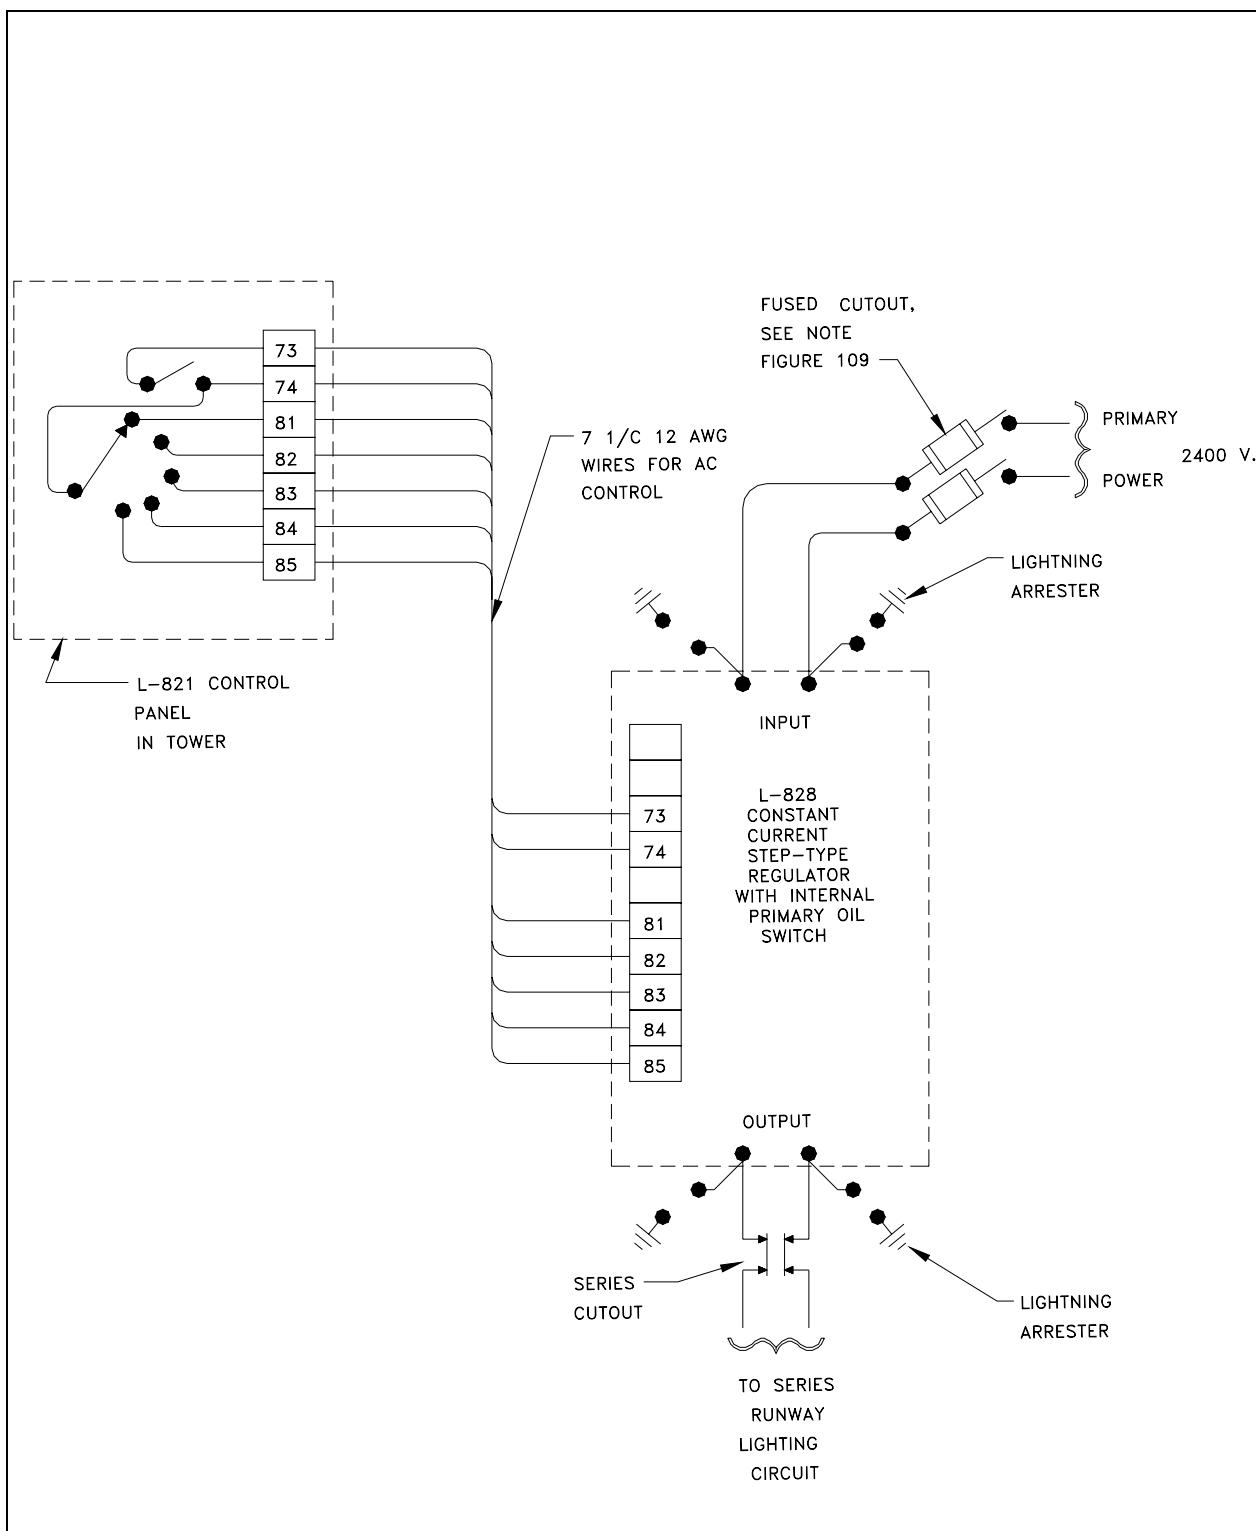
Typical Wiring Diagram Utilizing L-828 Step-type Regulator with Internal Control Power and Primary Oil Switch
